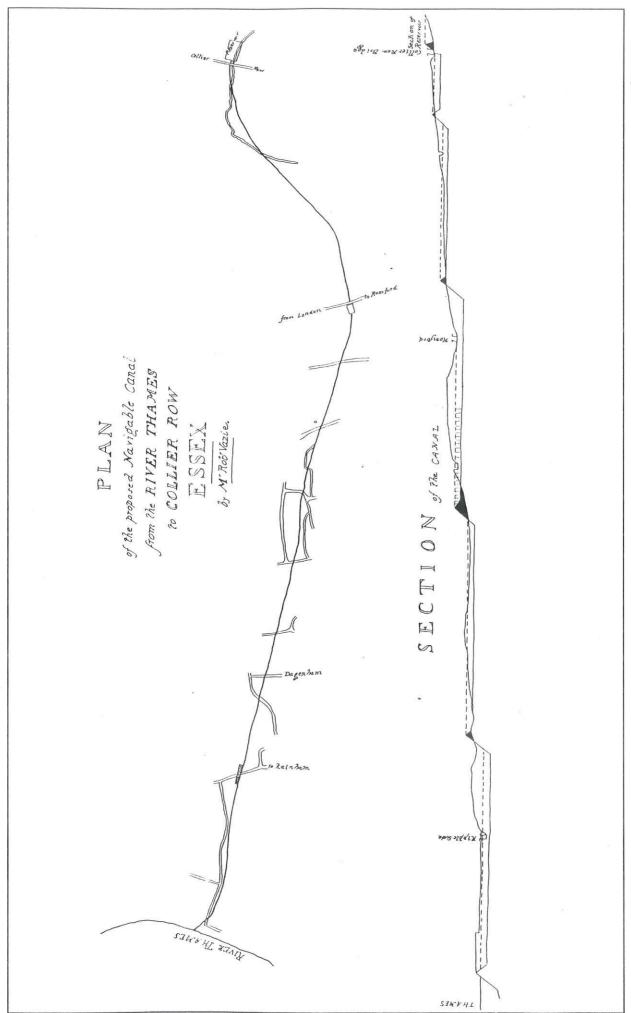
Plan of 1820 proposal for canal from Thames to Collier Row
